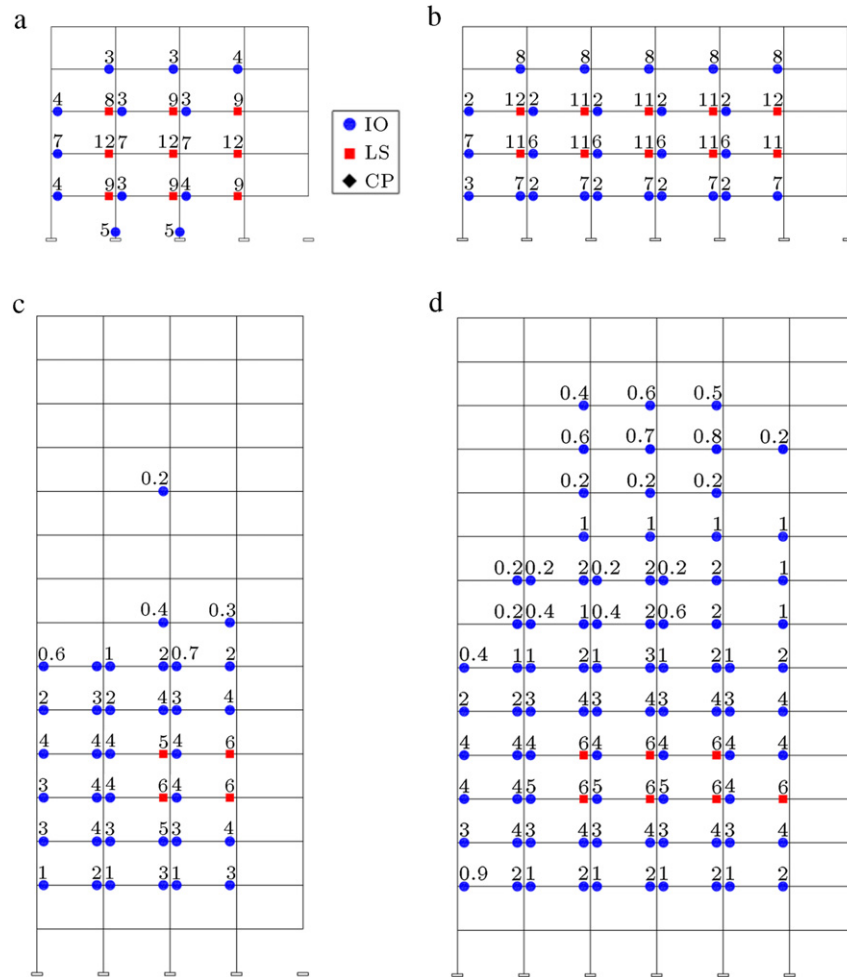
Formation of hinges when corner column is completely removed under triangular positive load pattern (rotation in thousandth of radian). (a) 5-story 4-bay structure; (b) 5-story 6-bay structure; (c) 15-story 4-bay structure; (d) 15-story 6-bay structure.
